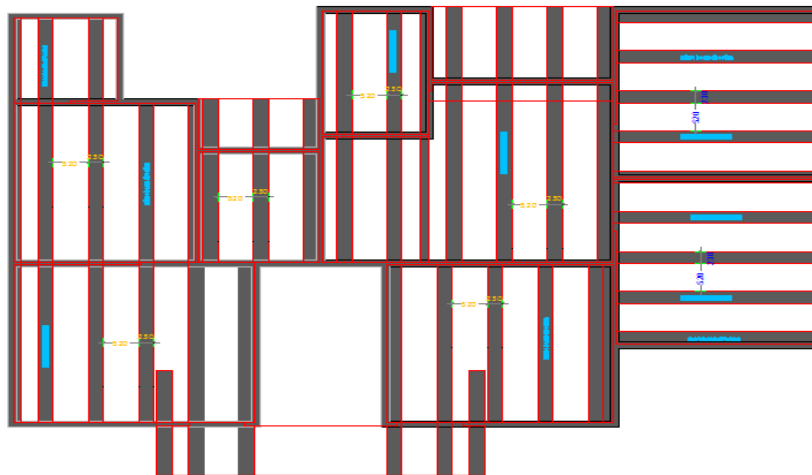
Network of embedded RC beams (concealed beams) in a floor of a typical building
